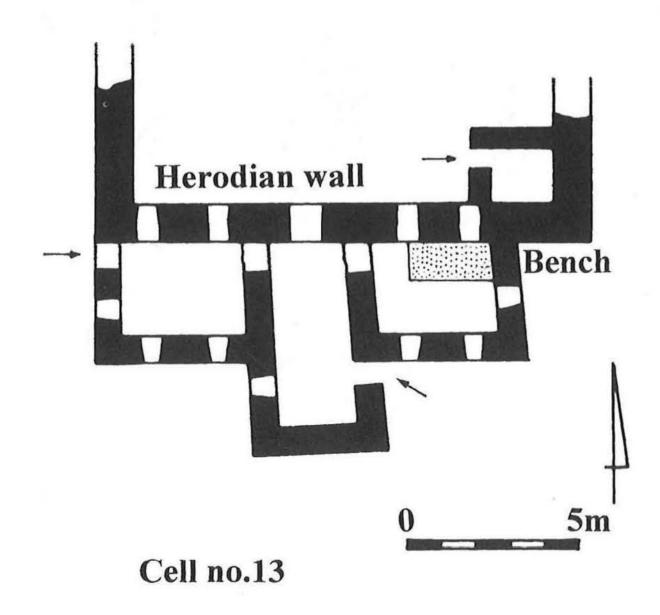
Plan of Cell 13 abutting the Herodian pool (after Masada III, Plan 45).
